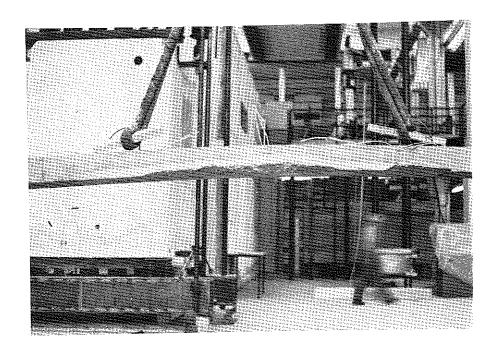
Picture of the spalling developed during a fire test.
